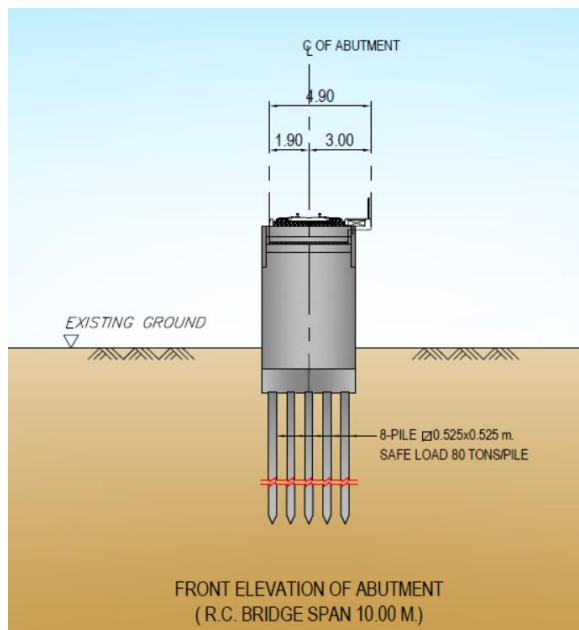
Cast In-situ Reinforced Concrete Slab bridge
